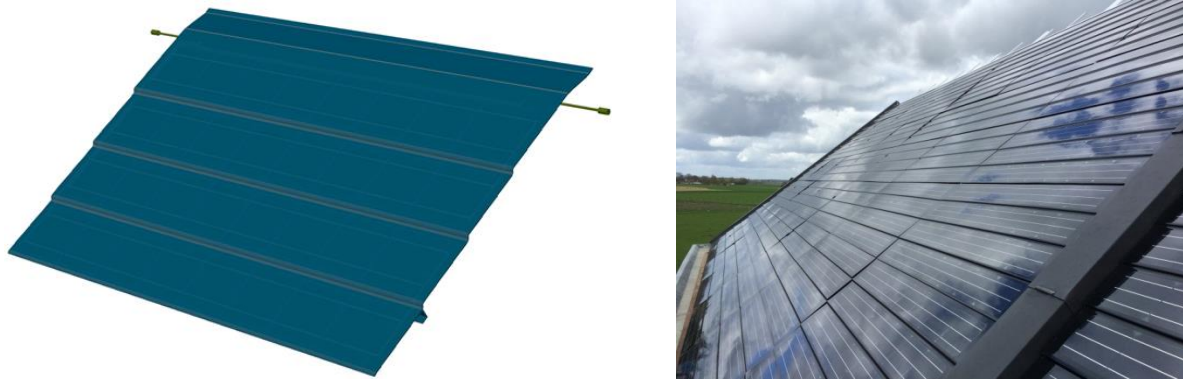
Design of saw tooth roofing shingle (left) and manufactured shingles (right)
